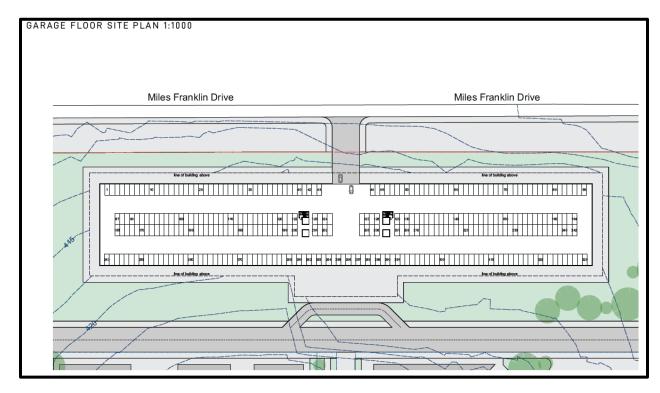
Spa Hotel Garage Floor Site Plan Site Plan (Source: Robert Harwood Architects)
